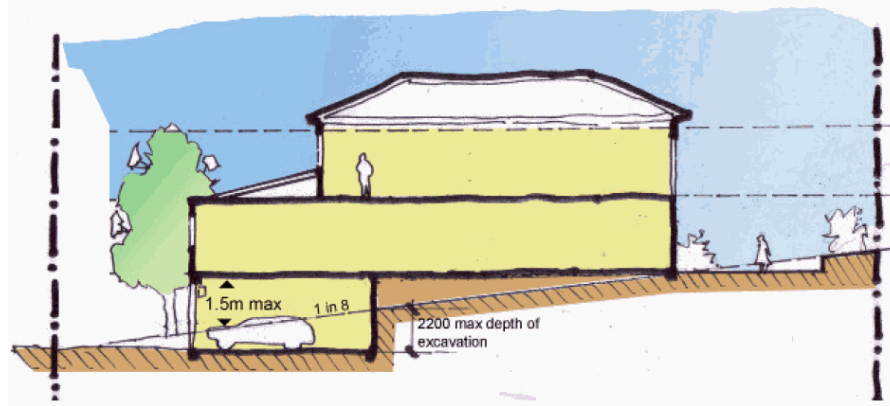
Section of development with basement garage, where slope of site is 12 degrees or more.
